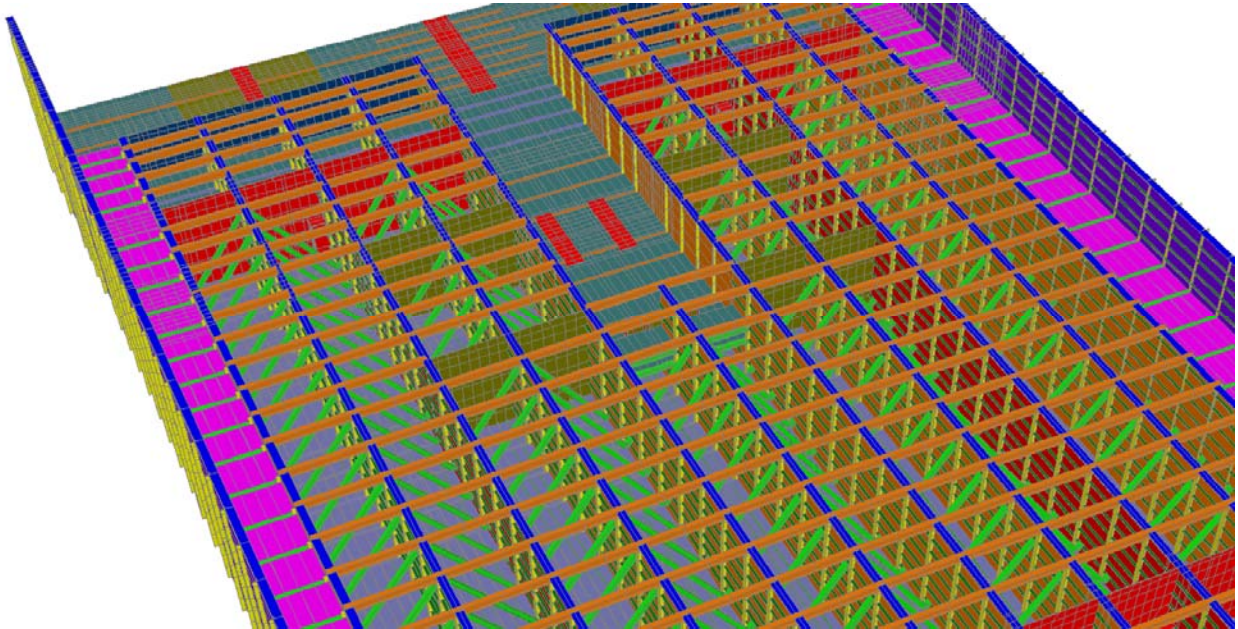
3D Model top view enlargement, concrete deck slab not shown
